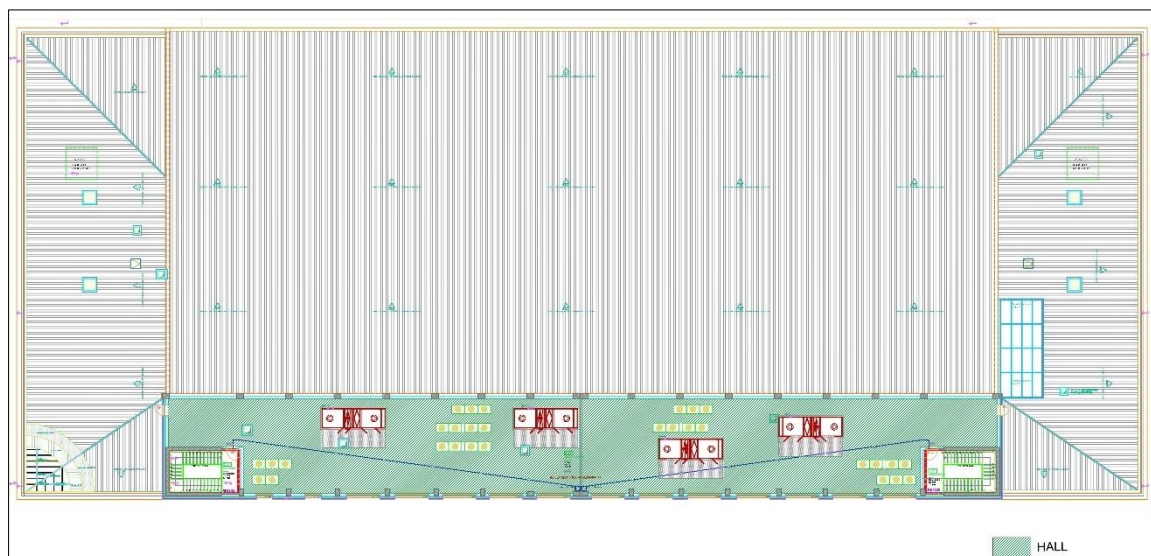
Horizontal escape ways in the roof floor of the printing service building
